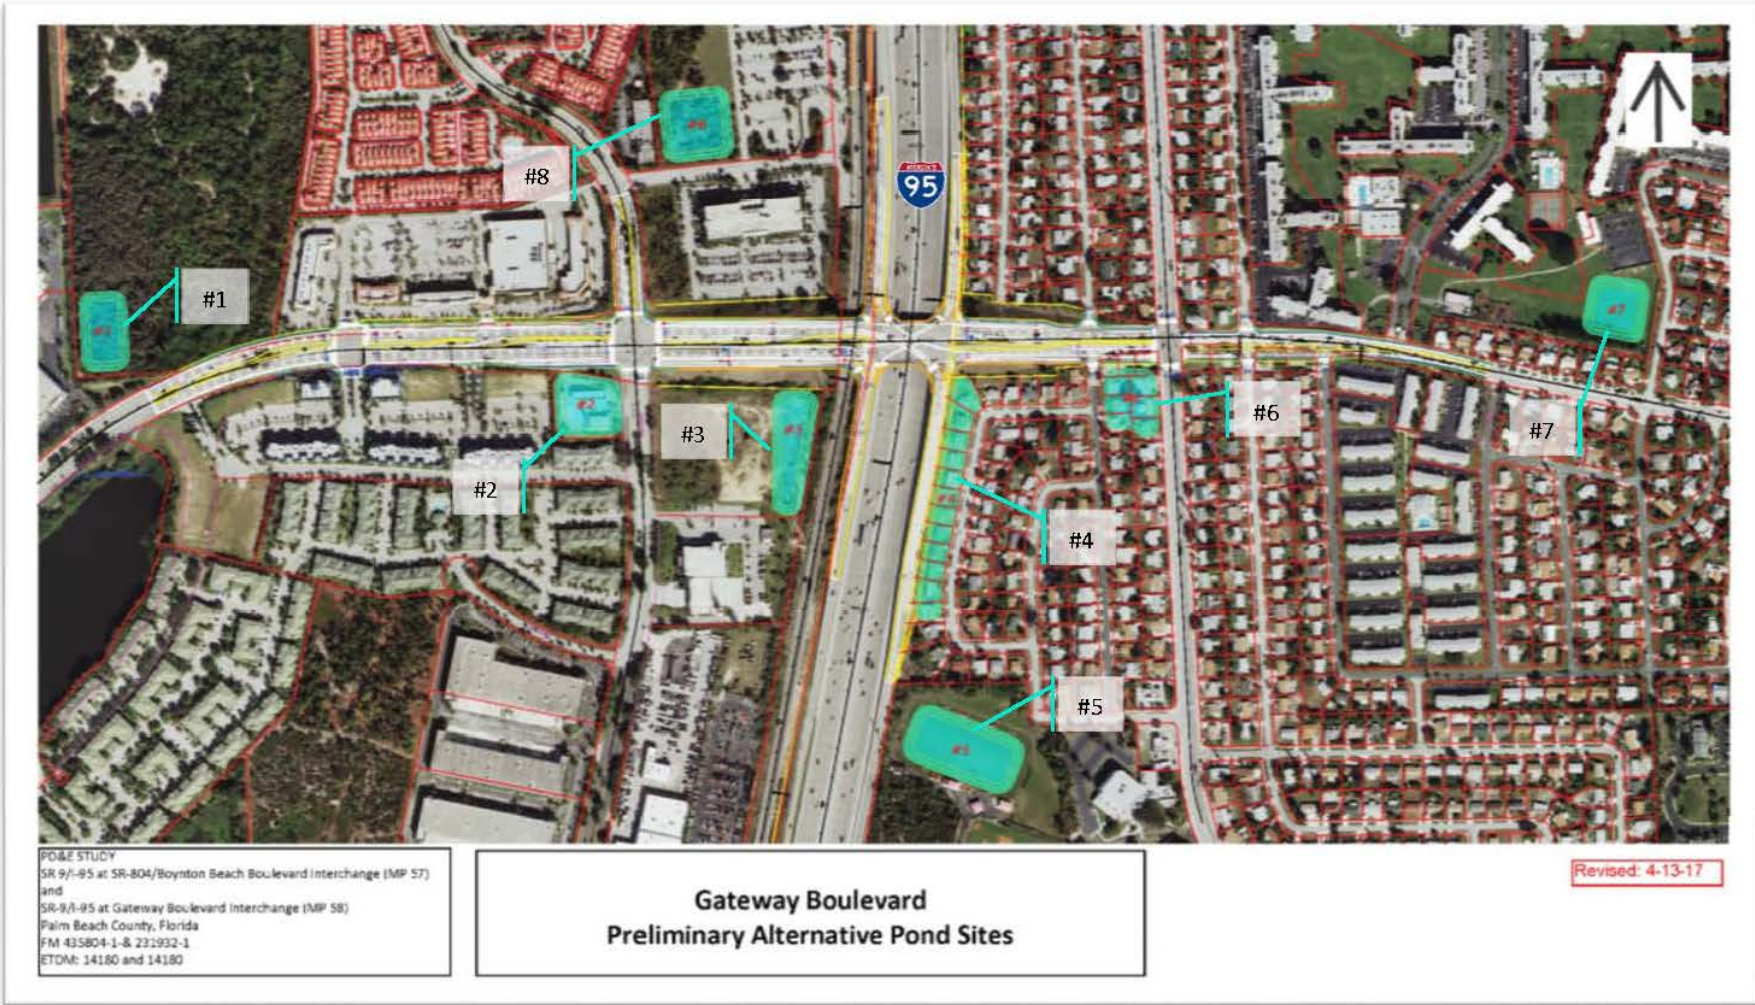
Preliminary Alternative Pond Sites – Gateway Boulevard
